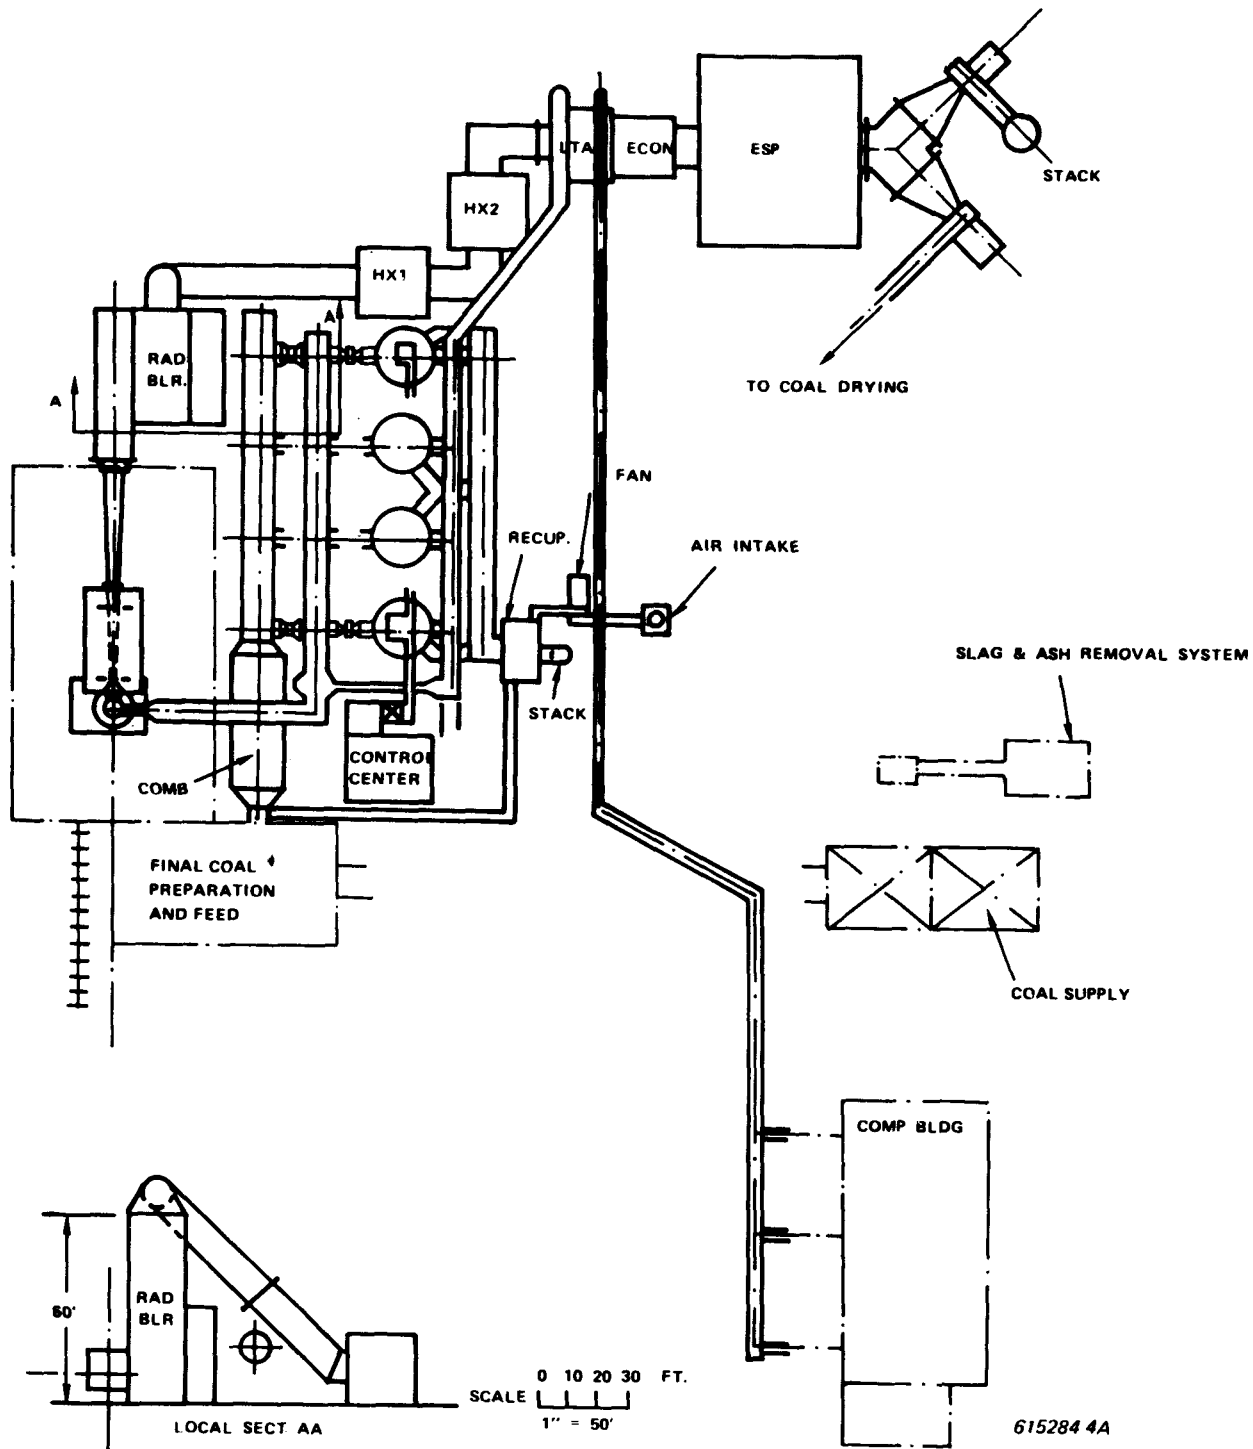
150 MW ETF Plant Layout - Configuration 4
